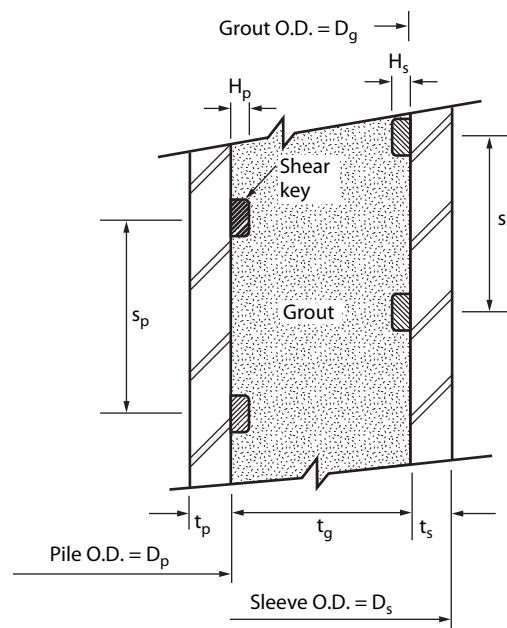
Grouted Pile to Structure Connection with Shear Keys
